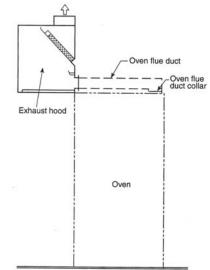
Typical Section of Eyebrow-Type Hood.
